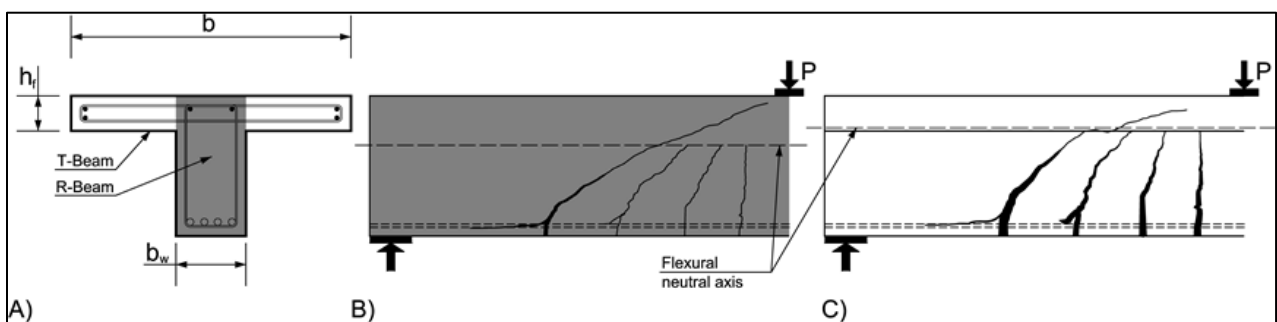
Comparison between T-shaped section beam and rectangular beam. (A) Sections. (B) Crack pattern scheme of a rectangular beam. (C) Crack pattern scheme of a T- beam [13].
